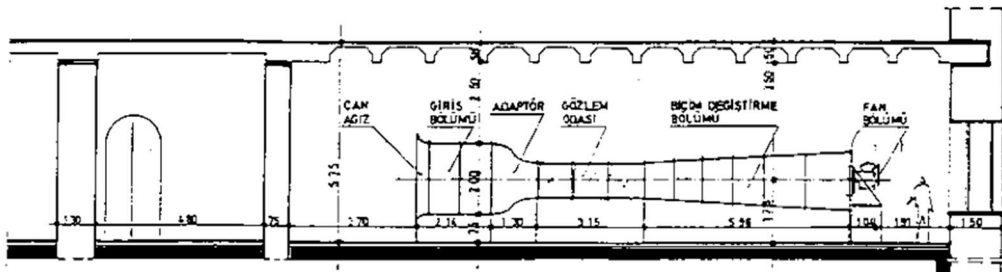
I.T.U. Arch. Fac. Phy. Env. Cont. Lab. wind tunnel unit layout in section.
